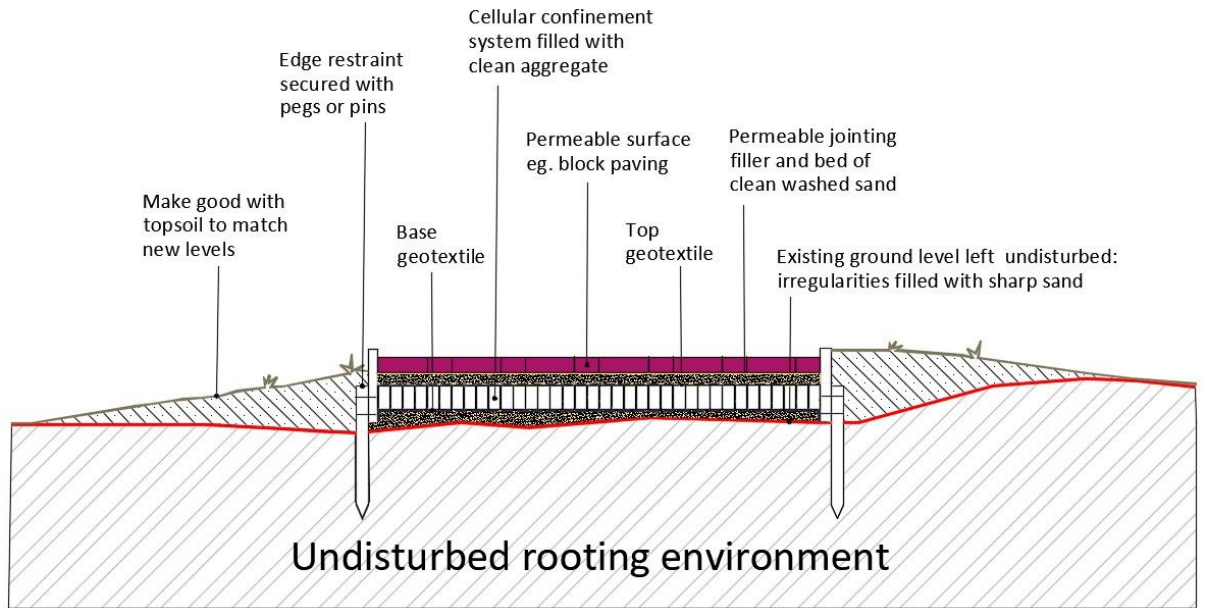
Typical detail of tree-sensitive paved surface | DCC
